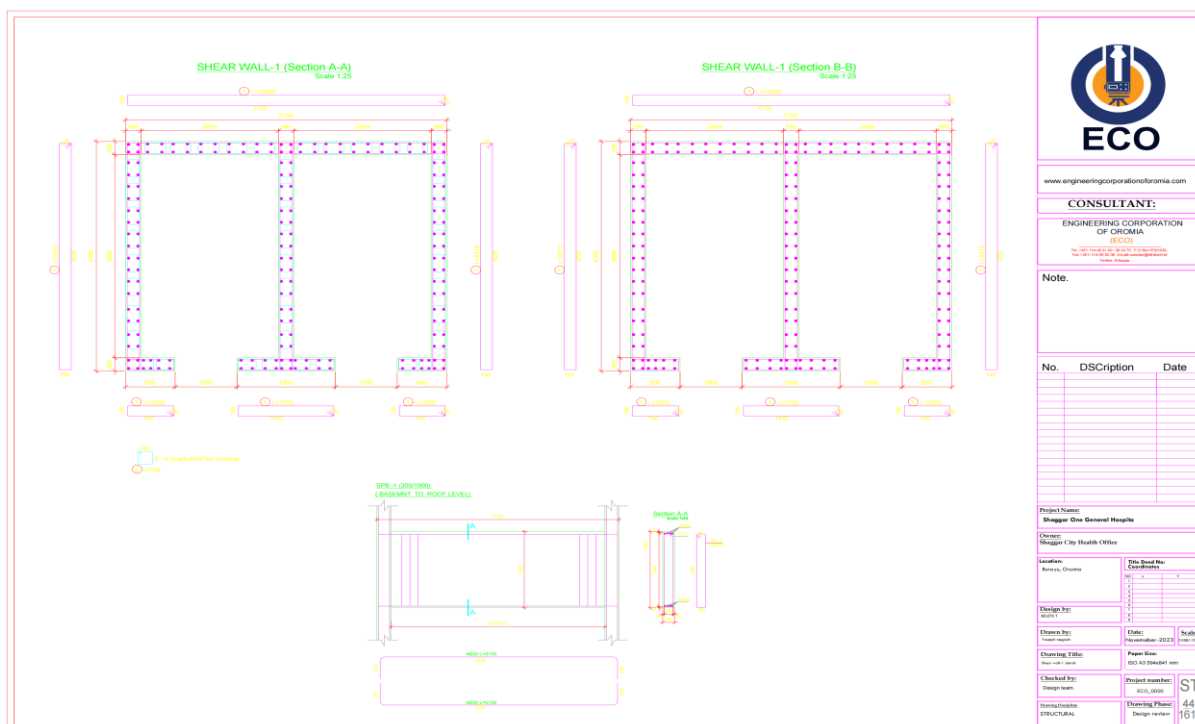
Elevator Shear Wall (SW-1) Structural Section Detail.
